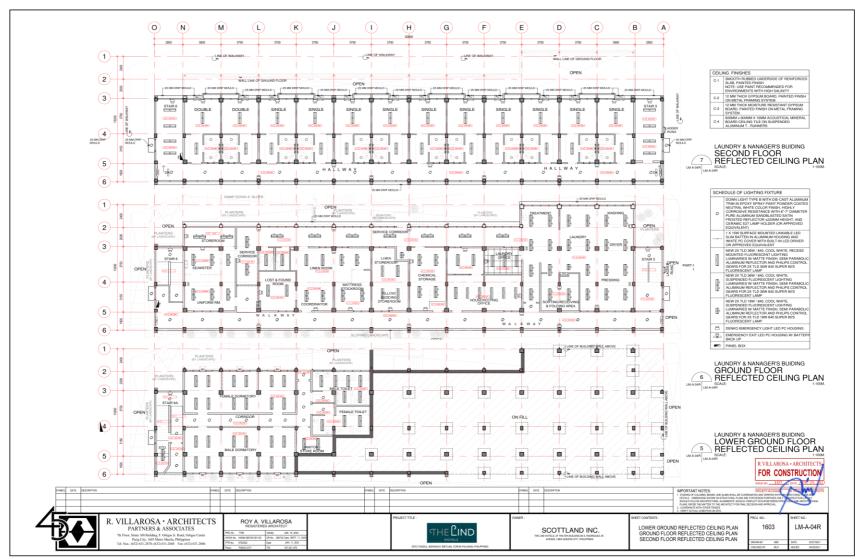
Lower Ground Floor Ceiling Plan (Laundry), Ground Floor Ceiling Plan and Second Floor Ceiling Plan
